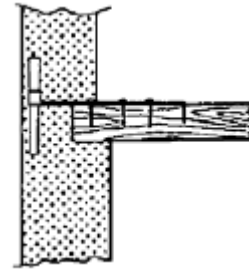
Wooden elements used for connection improvement (from E. Vintzilaiou – “Lecture notes on Advanced Mechanics of Masonry”)
